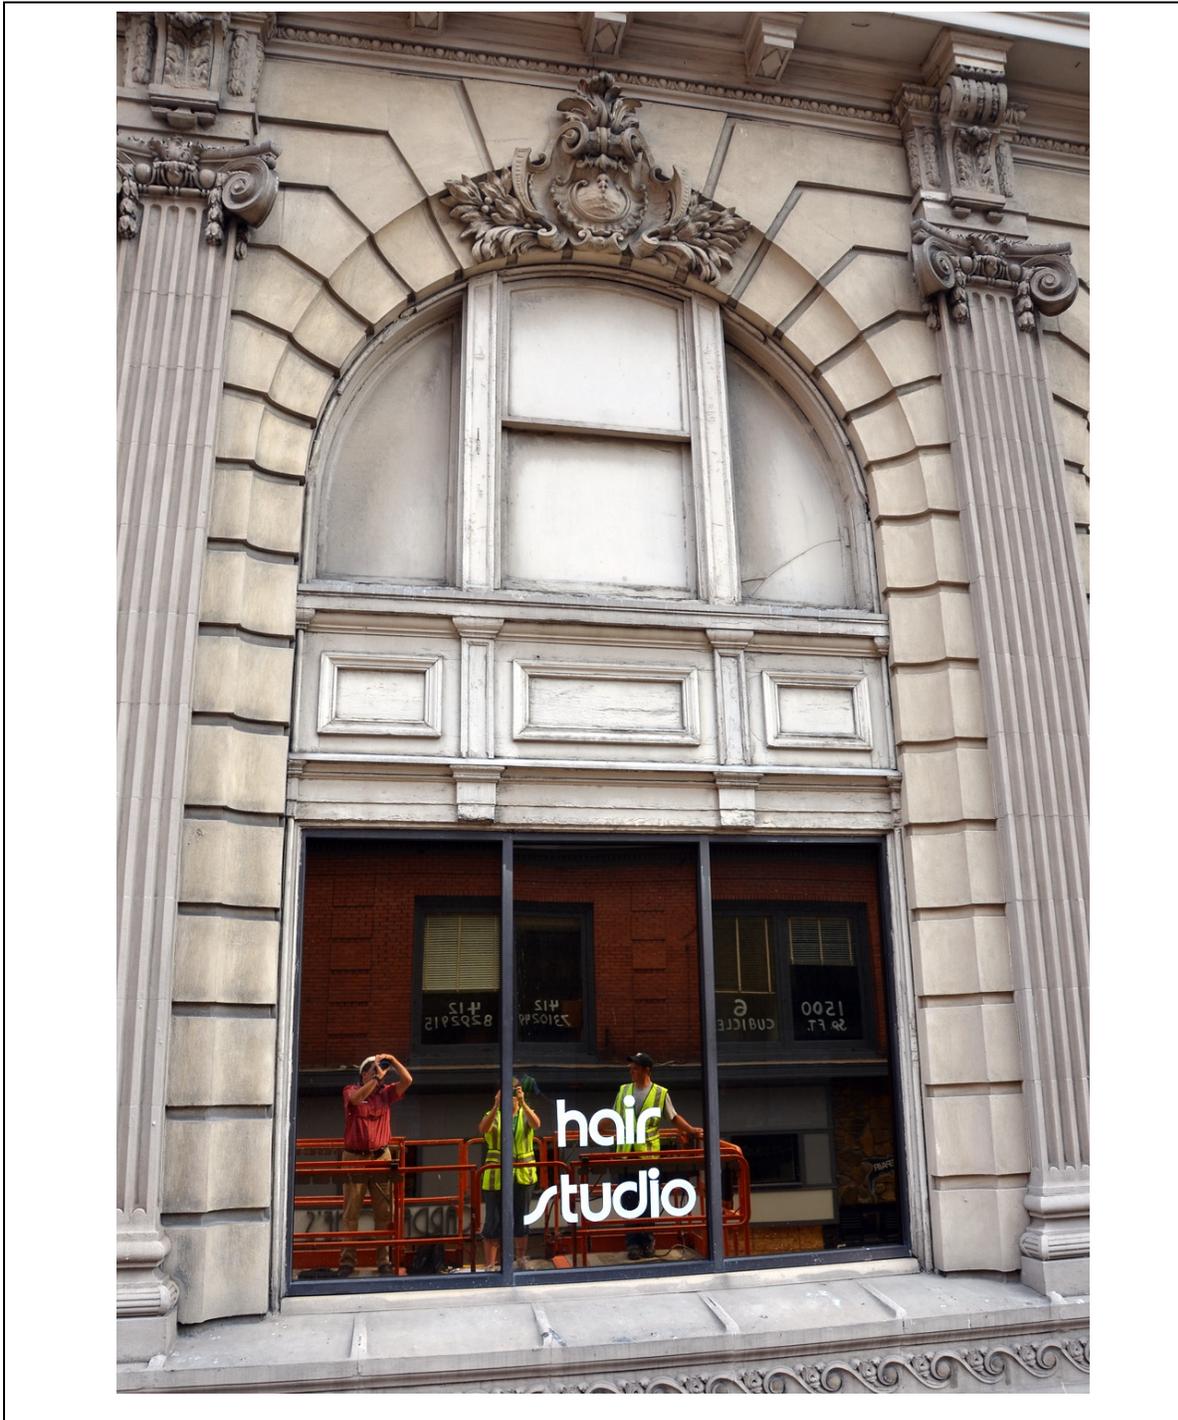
Detail of round arch window on third floor embellished with a terra cotta keystone.
